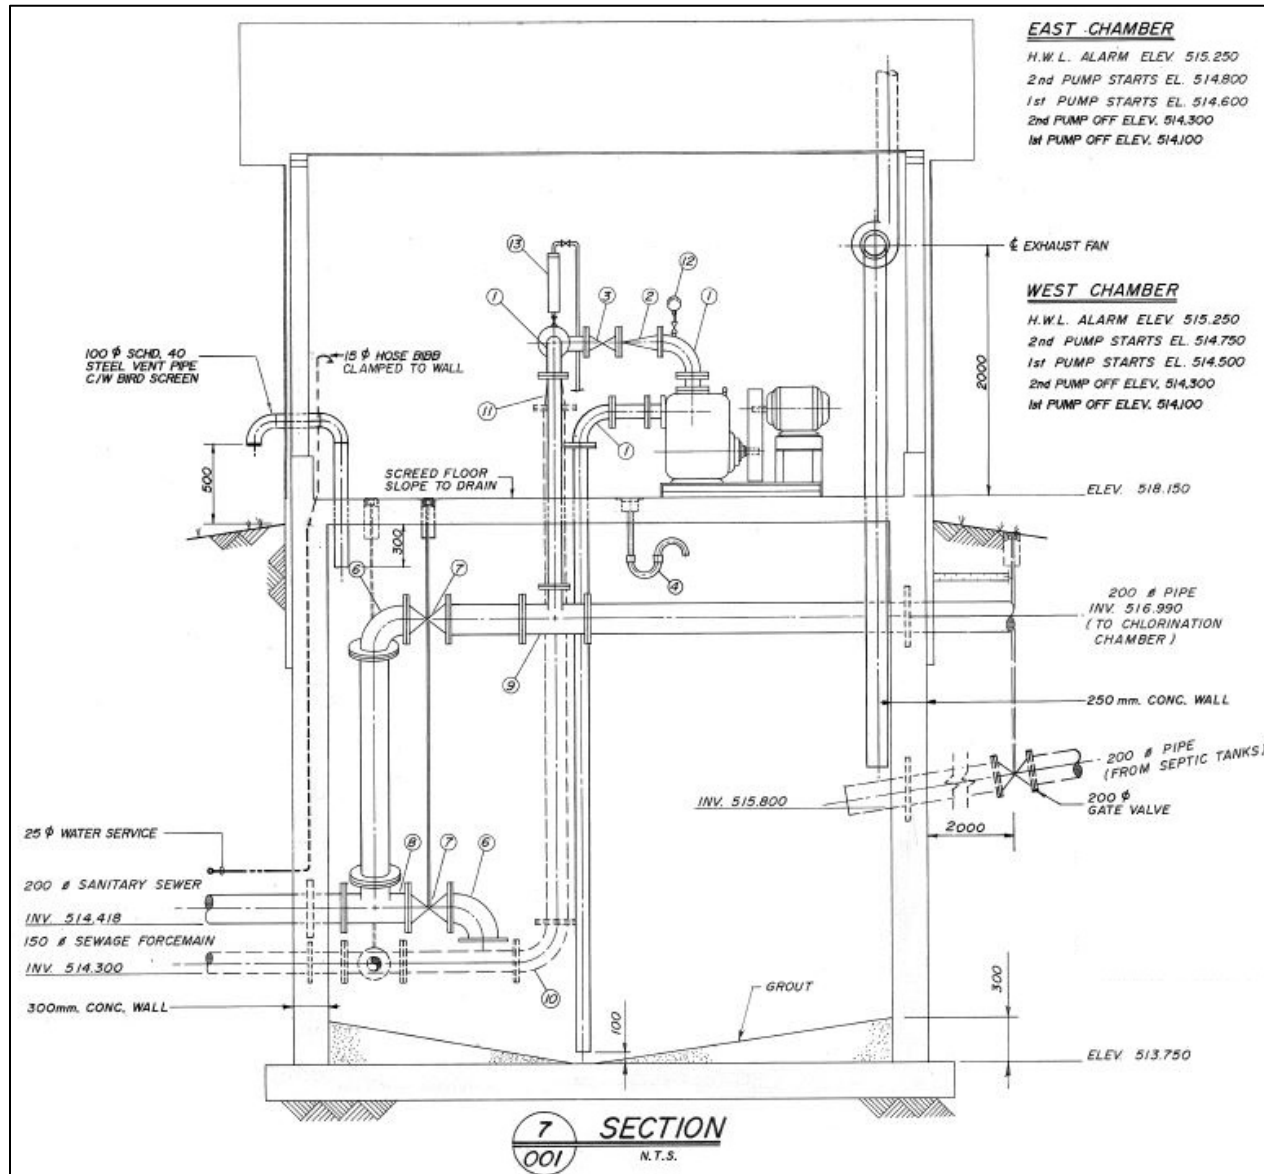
Lift station cross section (Bullée Consulting Ltd. 1988d)
